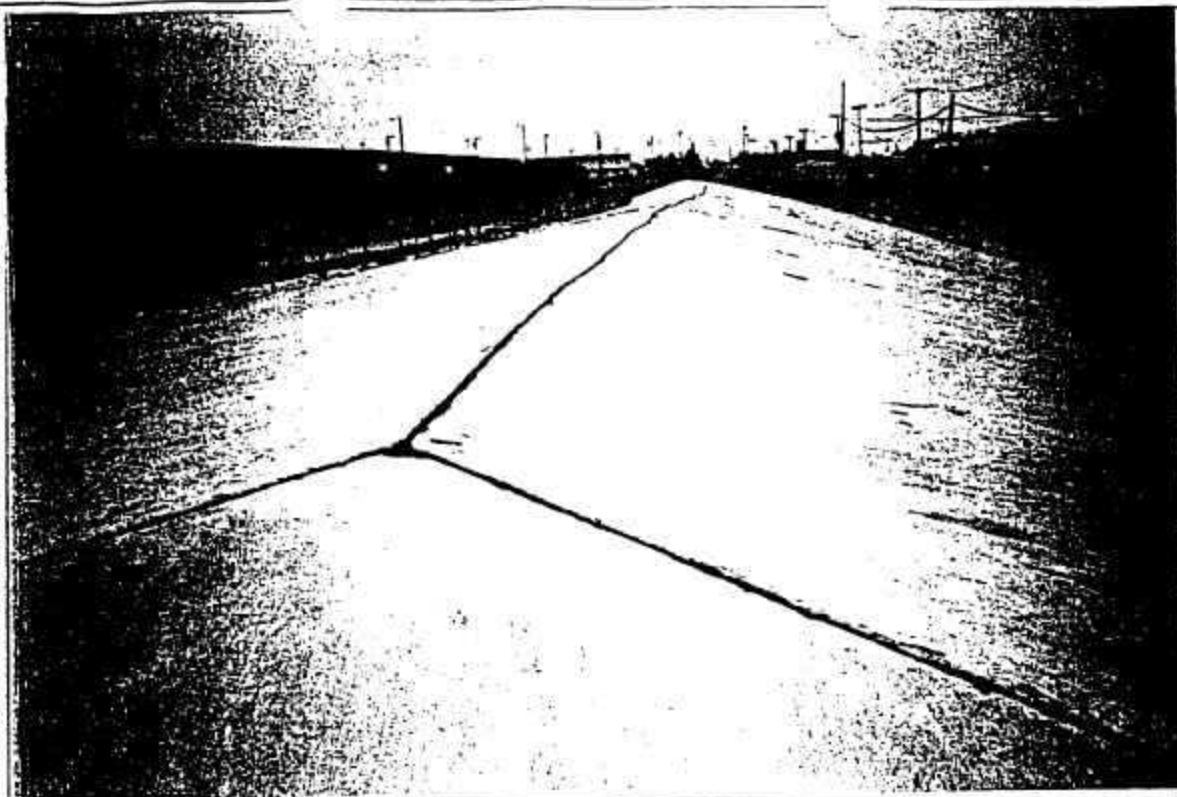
Grouting in slab seams was noted in good condition along sides and top as shown above. Photo taken facing south from north end of cap.
